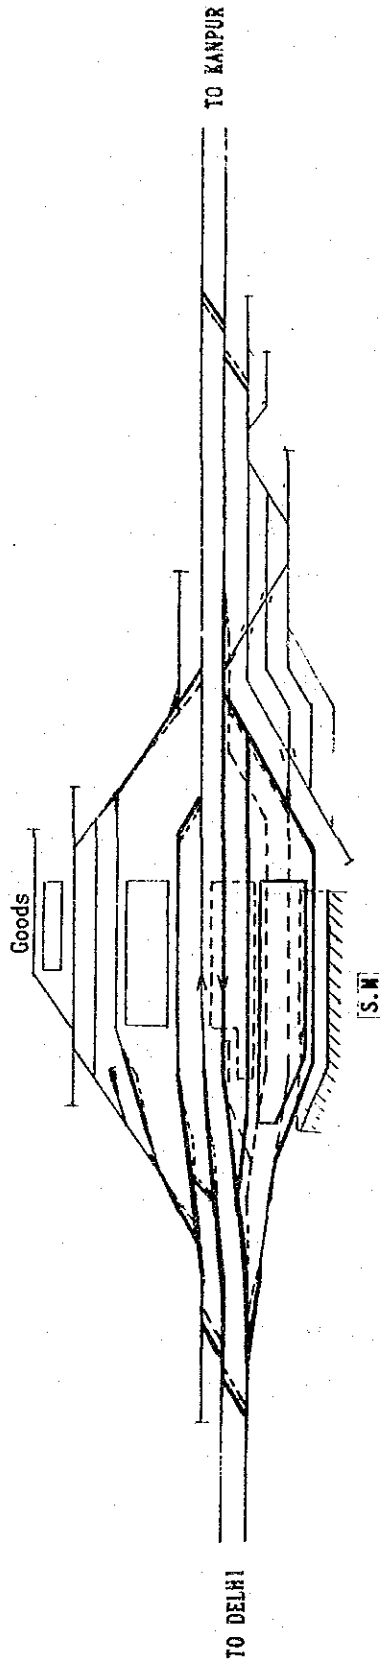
Etawah Station Yard Improvement Plan
